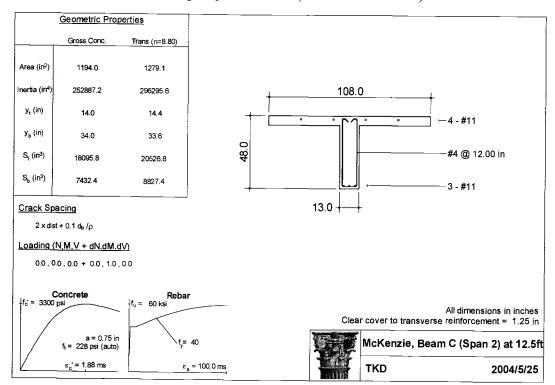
McKenzie R. Bridge; Span 2 at 12.5 ft. (RESPONSE 2000TM)
